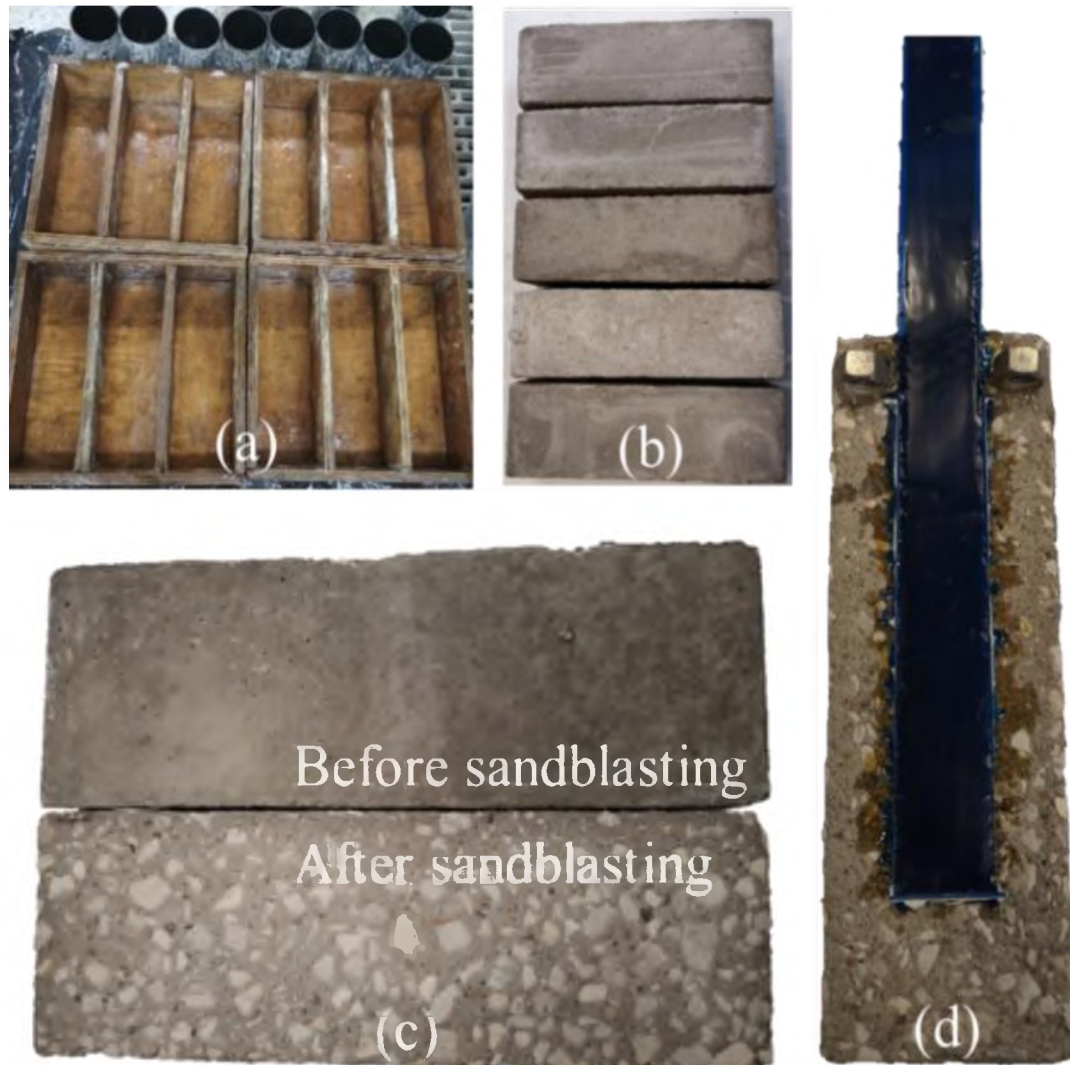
Construction of single-lap shear test specimens: (a) forms for concrete prisms and material property cylinders; (b) concrete blocks; (c) concrete surface before and after sandblasting; and (d) single-lap shear test specimen with concrete block and CFRP strip.
